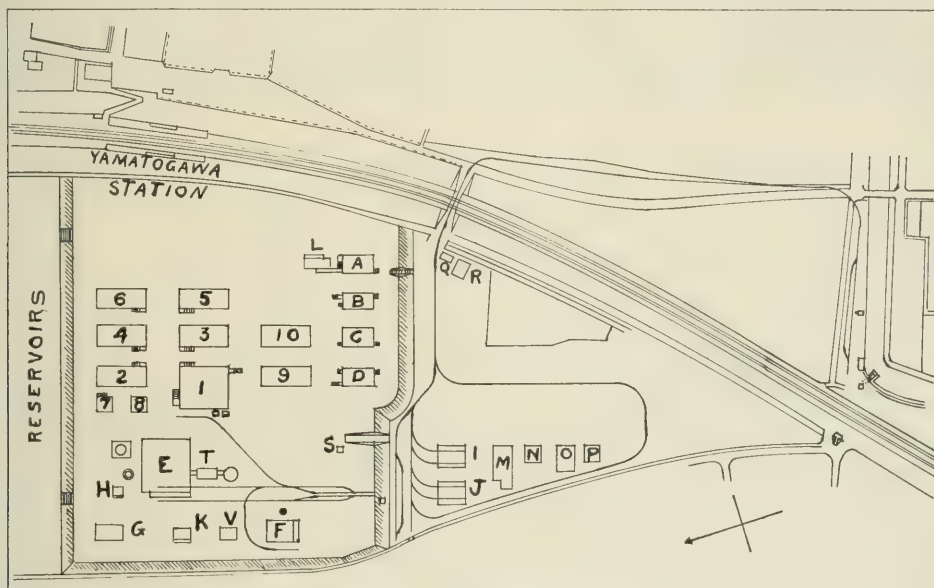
GENERAL PLAN OF SAKAI CELLULOID PLANT
